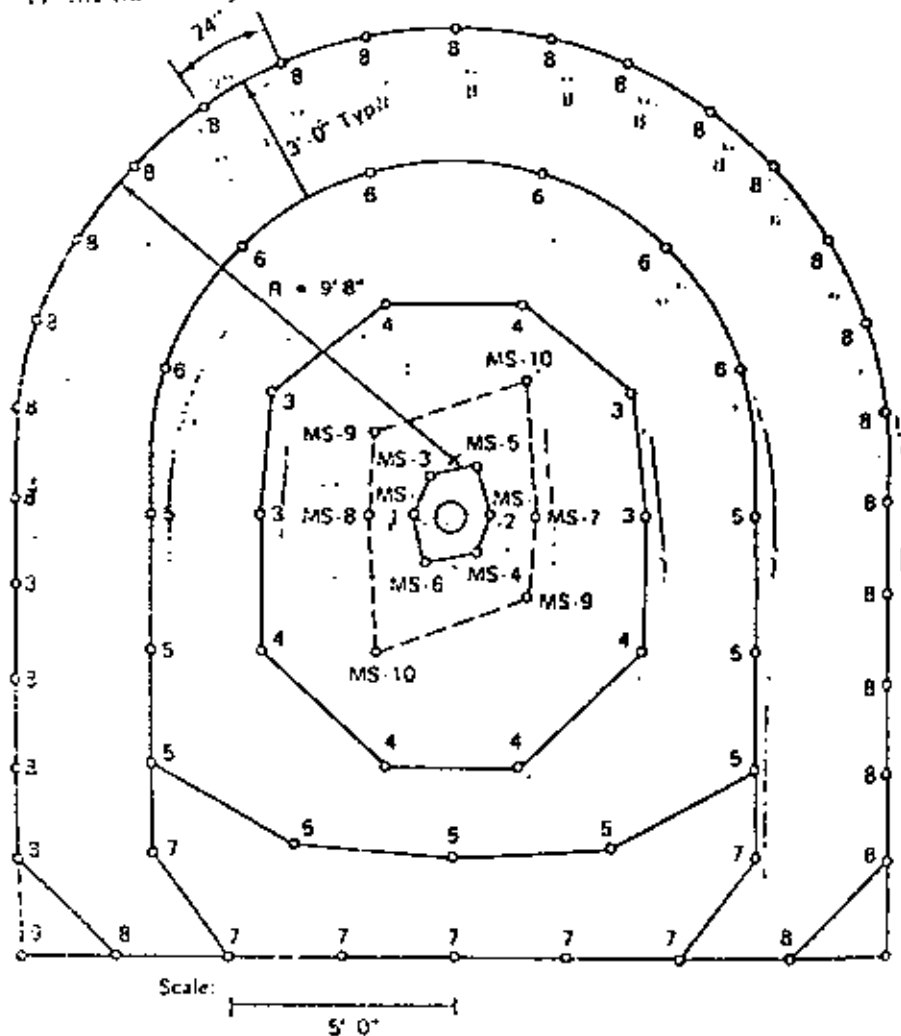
Typical smooth wall tunnel round. (After Deere, 1972)
